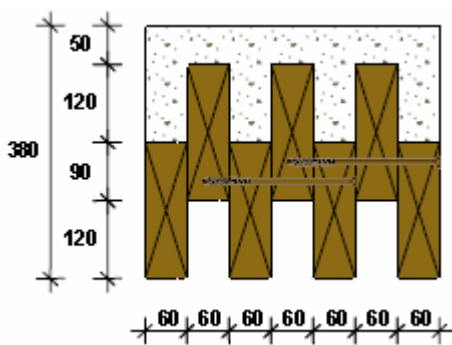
Cross-section of D-Dalle® TCC with Bare Concrete Floor
